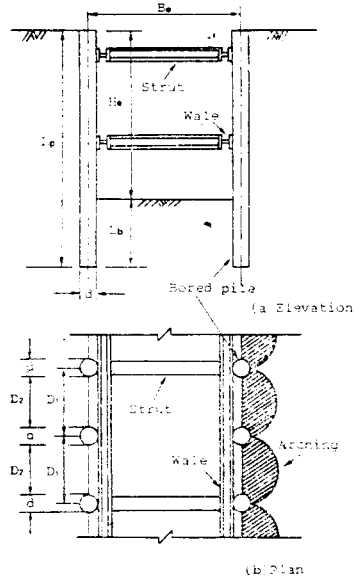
Braced earth-retaining wall constructed by a row of bored piles
